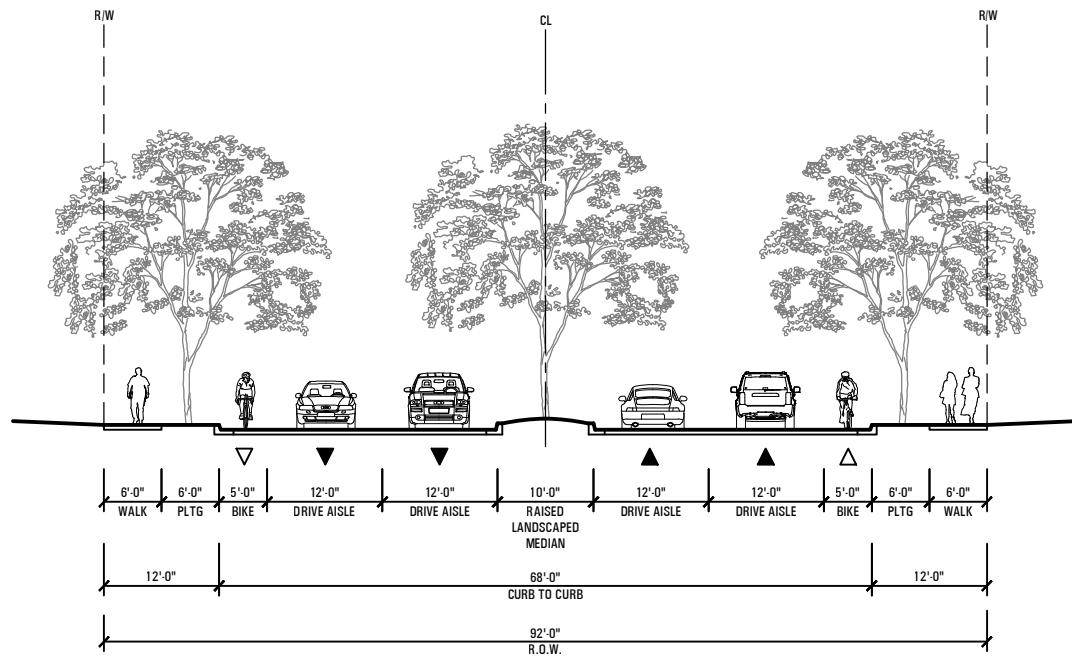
Citrus Avenue SectionFigure 14: Lytle Creek Road 4-Lane Section
